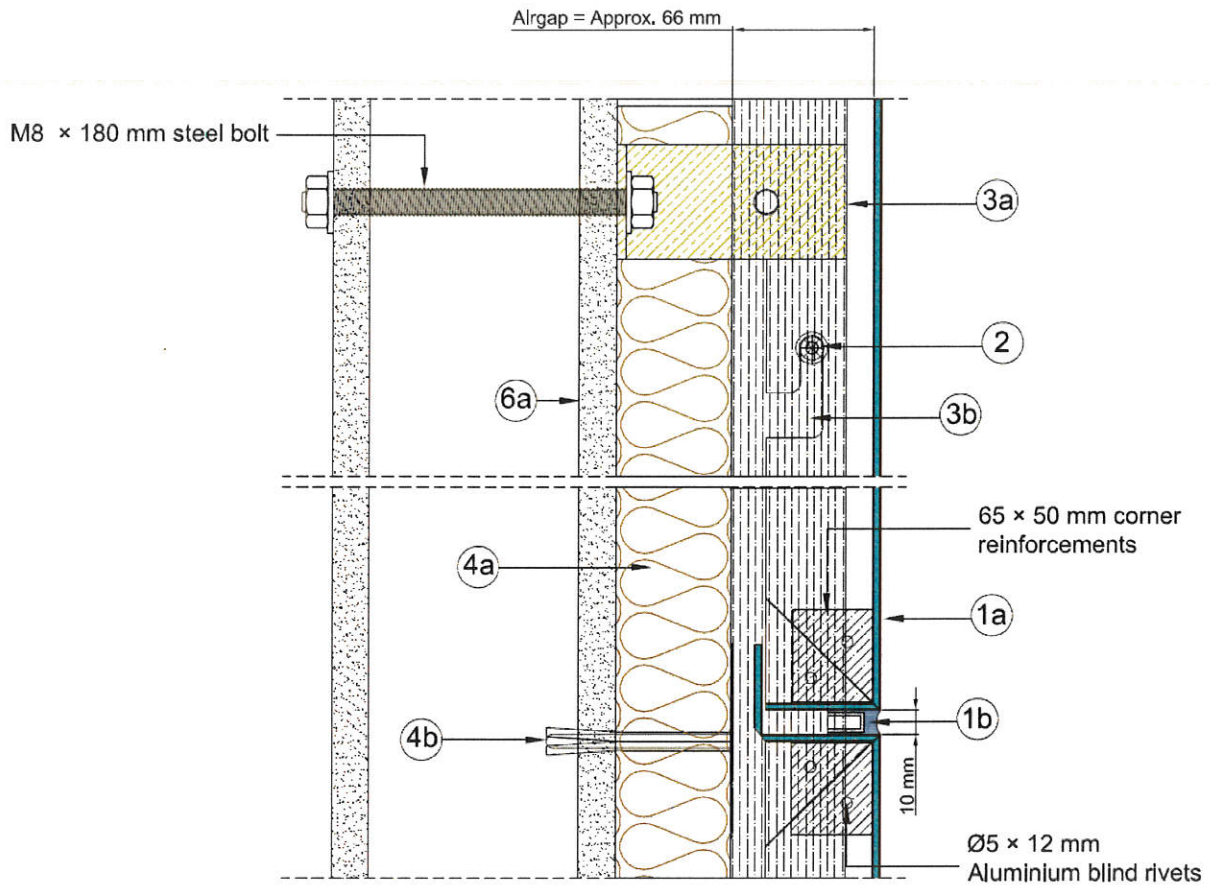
"ALBOND A2" 4.0 mm thick Aluminium Composite Material Non-Load-Bearing Exterior Wall Cladding Assembly vertical section details
